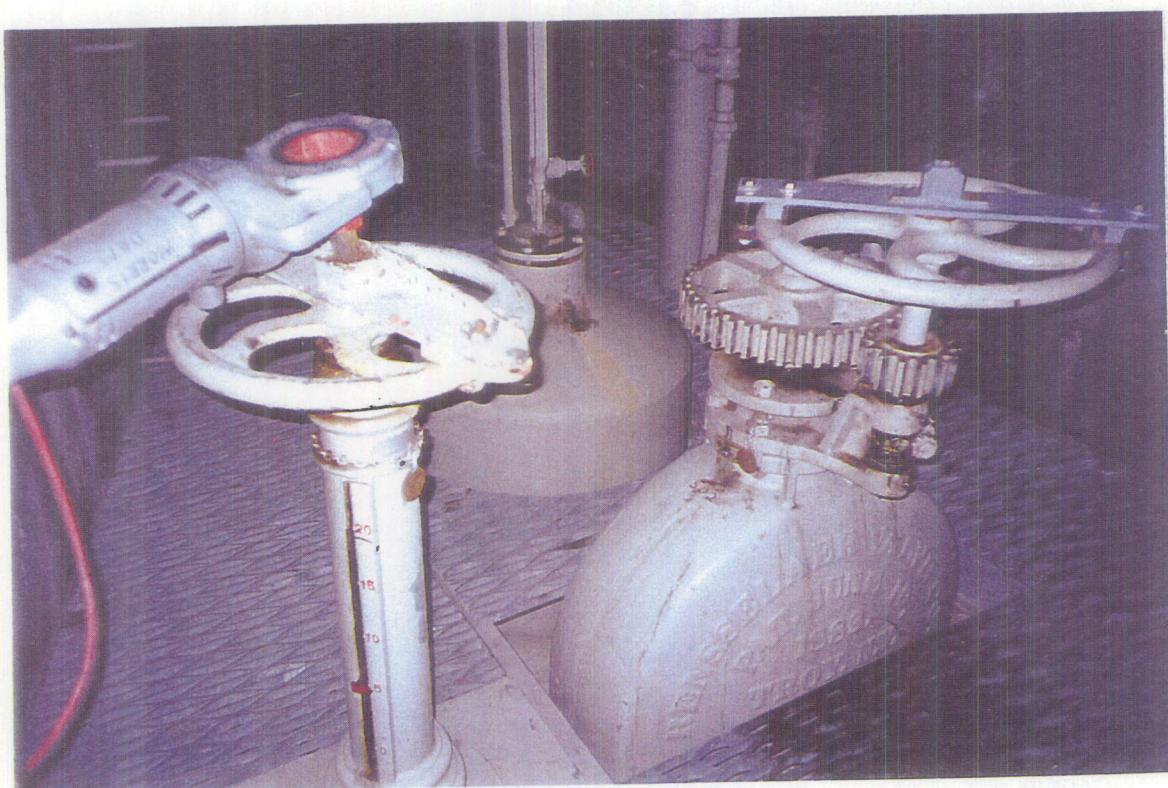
Morris Dam - Drum Gates - View of control valves for drum gate. 06/30/98
